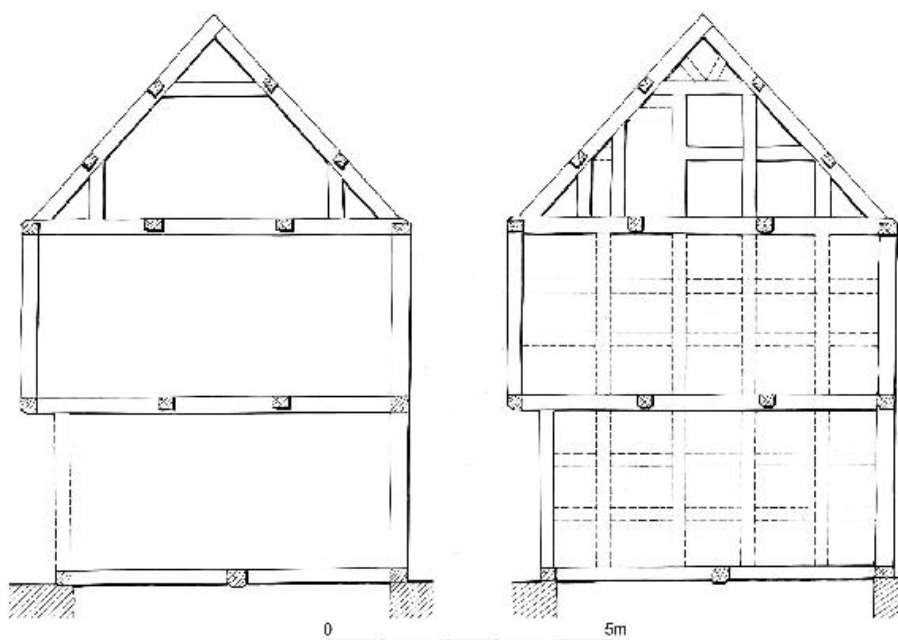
Outline survey and reconstruction of a cross-frame and gable-end frame of the jettied front range of 50a St Owen Street (street/north, to the left)
